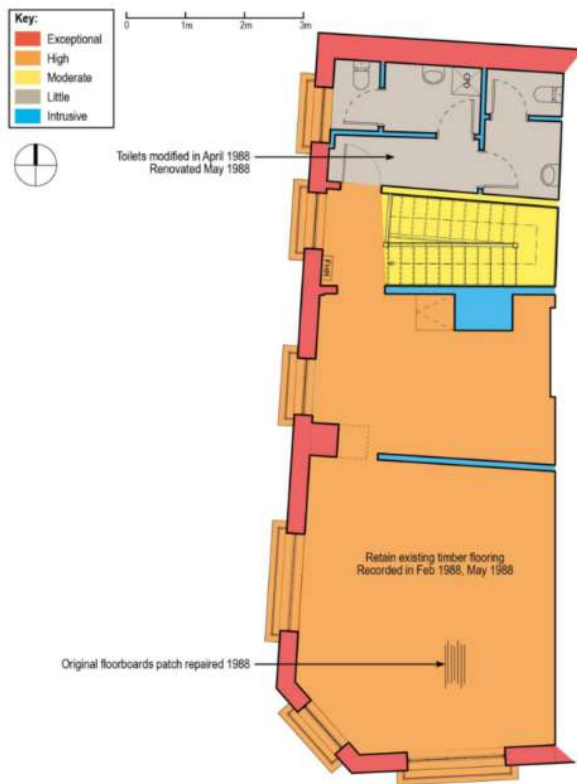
Plan of second floor showing gradings of significance and noting reconstructed and modified building fabric. Source: GML, 2017.
